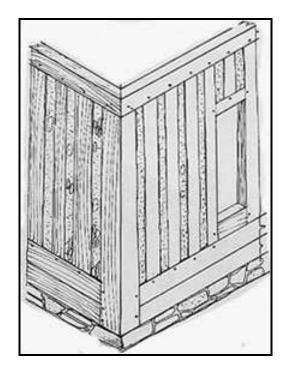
Wall with colombage pierroté fill (Lessard and Vilandré 1974: 110).
